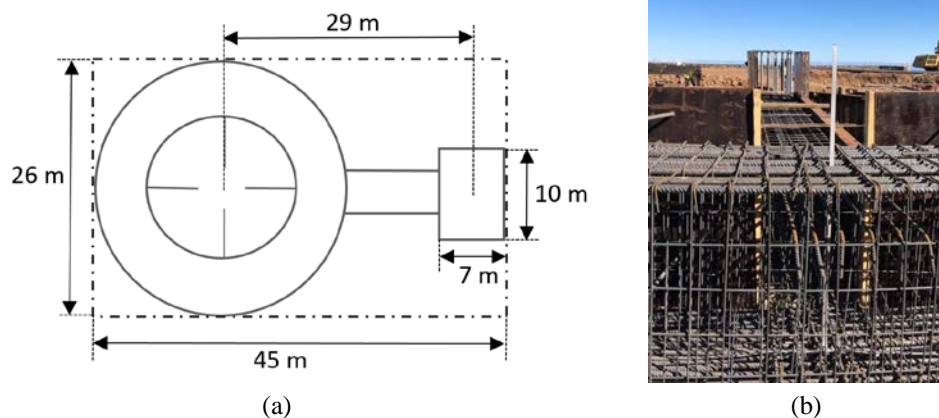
LST1 Foundation: Schematics showing the size of the foundation ground, which was connected to the camera access tower ground (a), and foundation structure (b).
